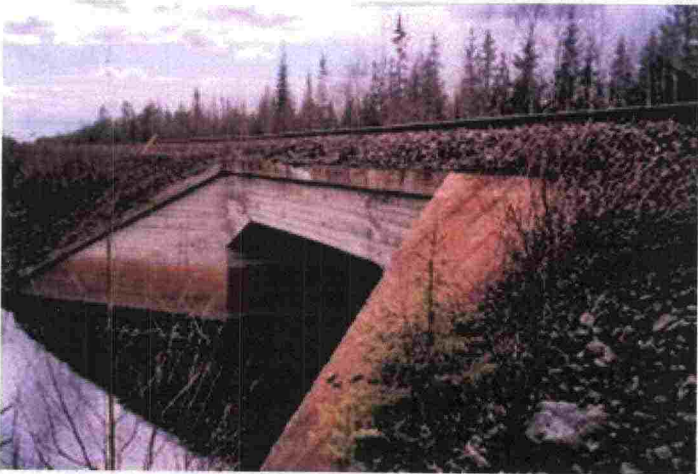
A typical concrete frame bridge, Sietkijoen, 1033+200, from 1963.
